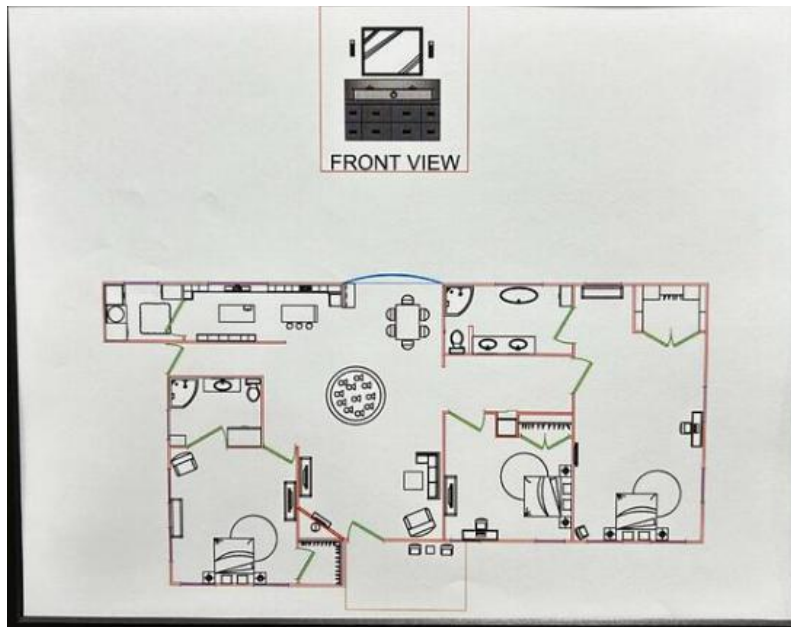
CAD Drawing of a floorplan and a 3D drawn model of a vanity
